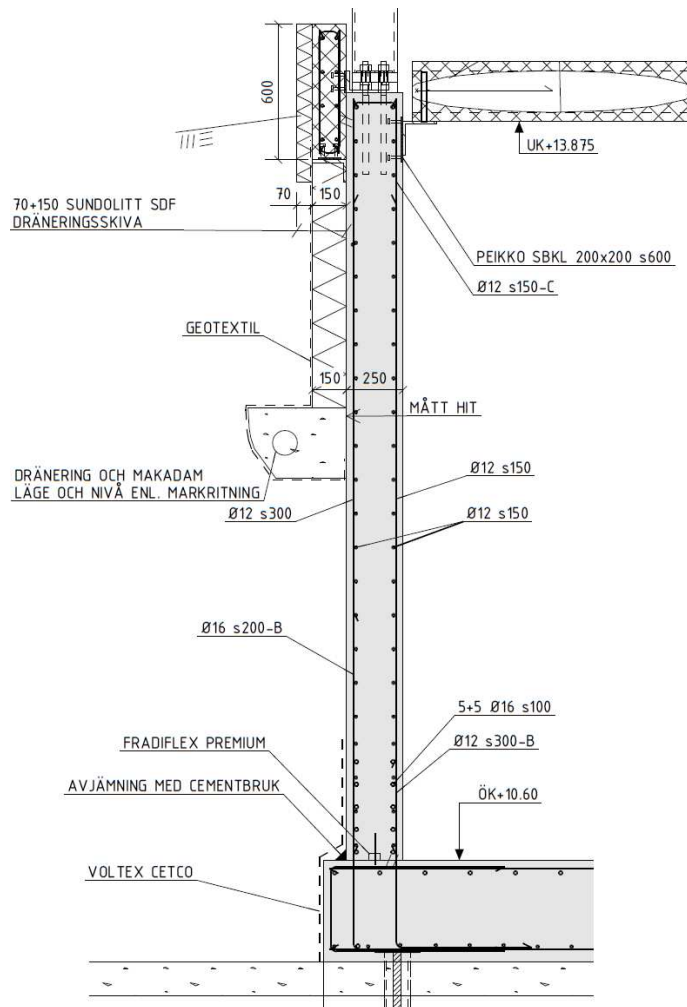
Detailing of wall 1 in object A [in Swedish], from building documentations
